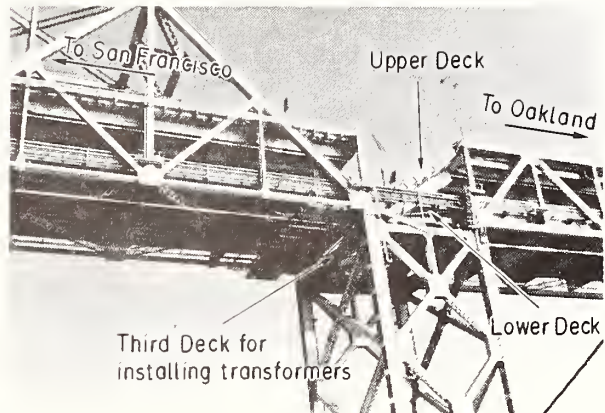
Fall of one-span decks on steel pier E9. Upper and lower decks fell down, but fortunately those two decks stopped on the third deck which install transformers (from CALTRANS).
